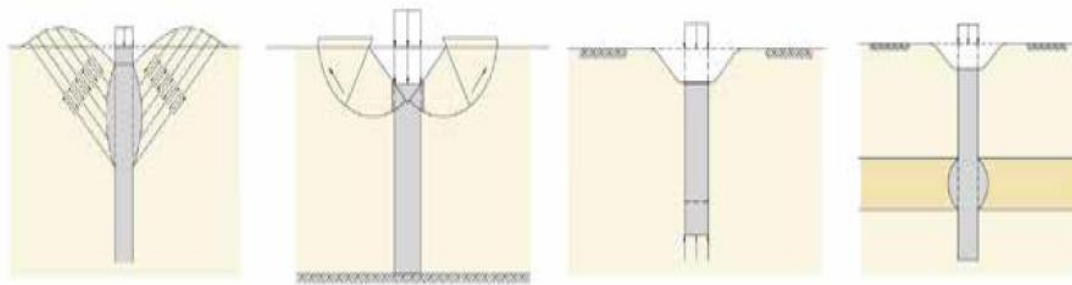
The possible failure modes of single stone column" bulging of long column, shearing failure of short column, sinking of floating column, and bulging in deep soft clay from left to right (adapted from Kirsch and Kirsch. 2010)
